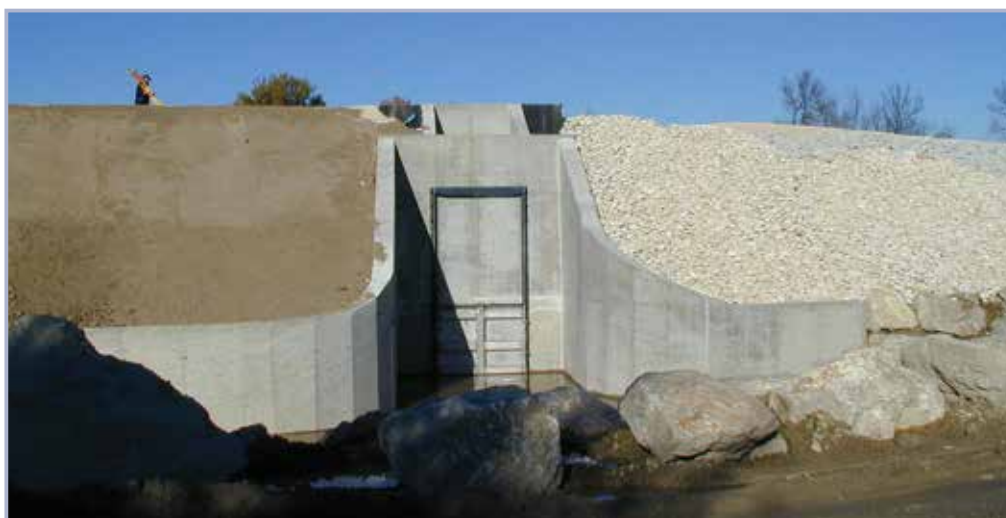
Completed structure at Aramon (courtesy Thibaut Mallet)
